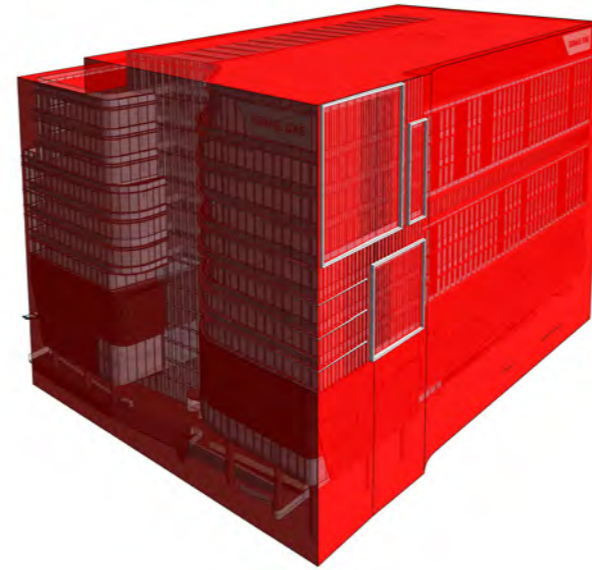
Parameter Plan envelope overlay. Aerial view at north east corner.
